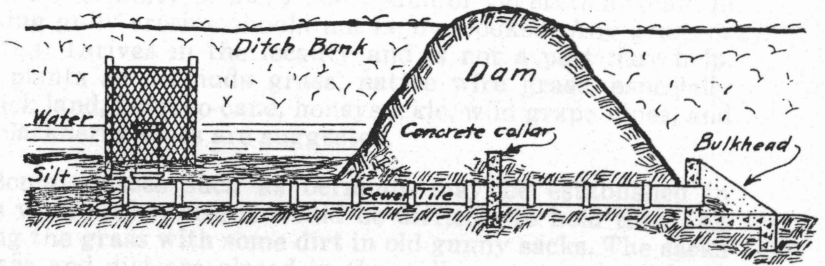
Soil saving dam with outlet pipe of sewer tile.
